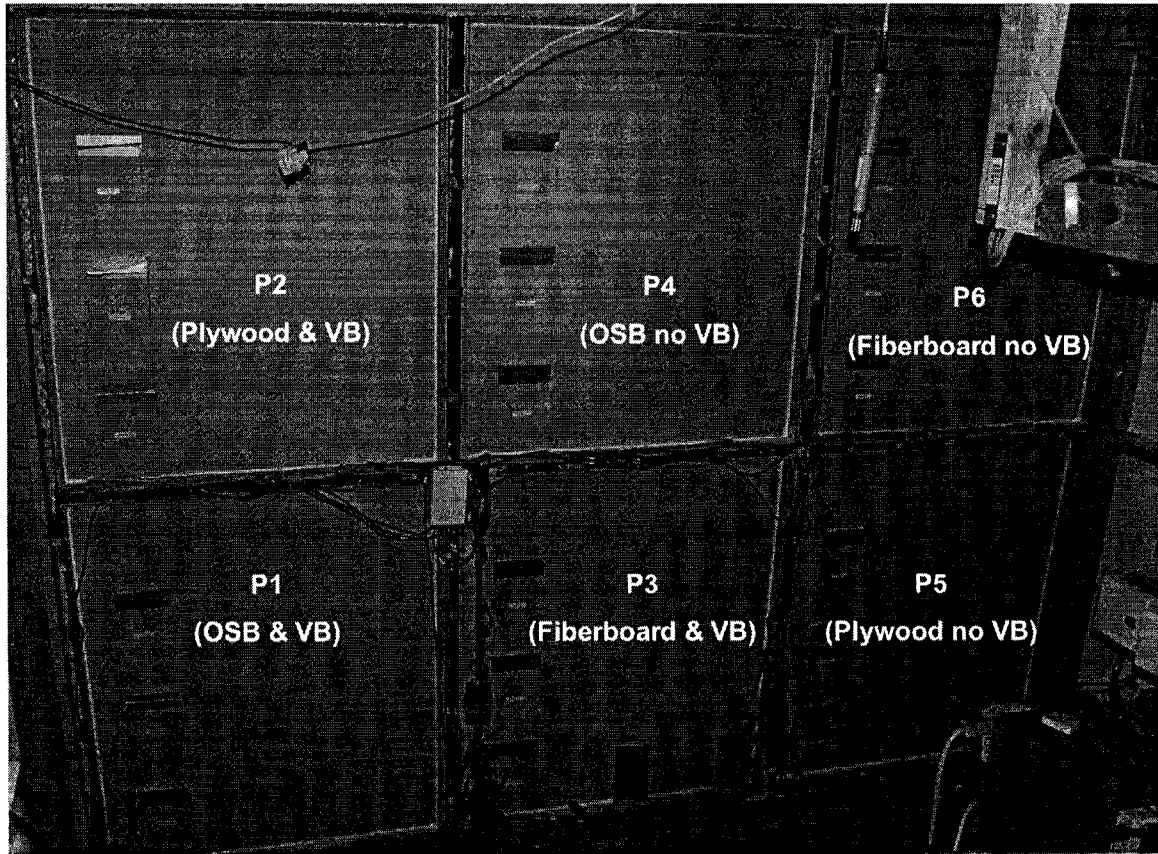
Photo of six specimens installed in test hut, taken from drywall side
